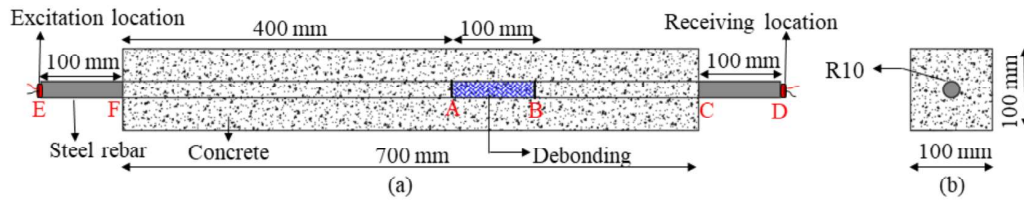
Reinforced concrete beam specimen (a) longitudinal view (b) cross-section
